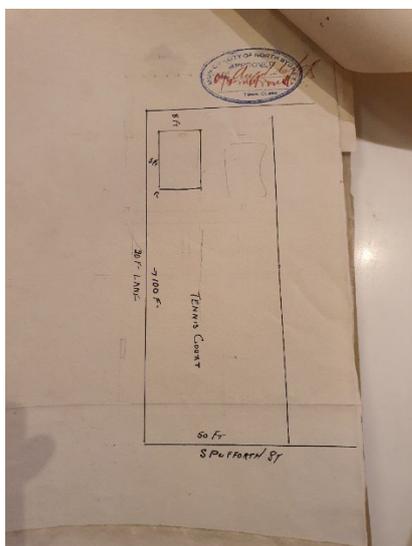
91: Block plan submitted with the application for No. 17 Glenferrie Avenue.
